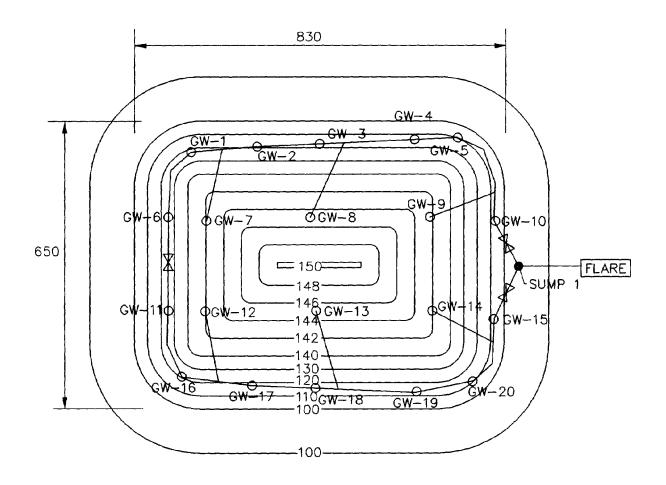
MODEL LANDFILL GAS WELL SYSTEM LAYOUT
